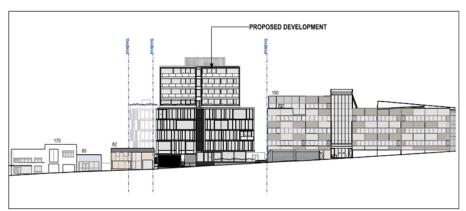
Street elevation showing the proposed development. Source: JAWS.
